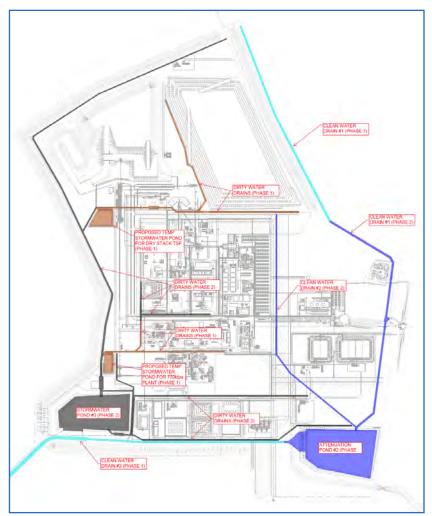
Overall Primary Stormwater Drains and Ponds
